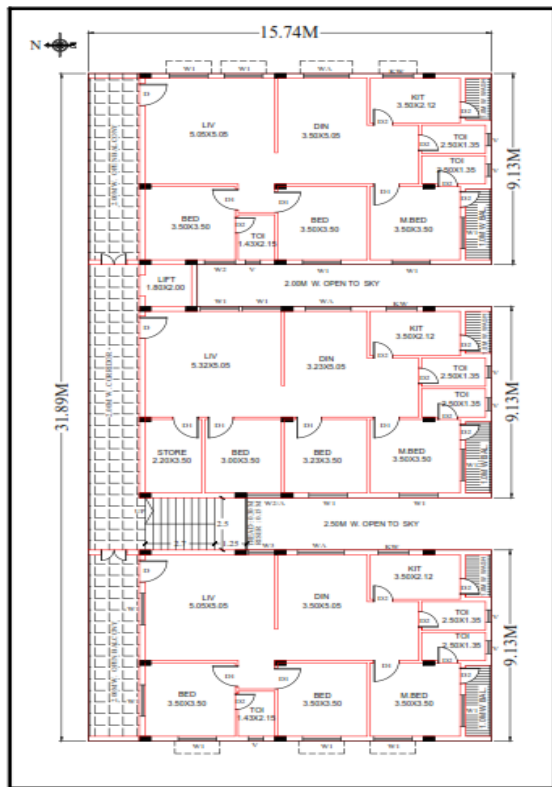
Typical Ground, First, Second & Third Floor Plan.
